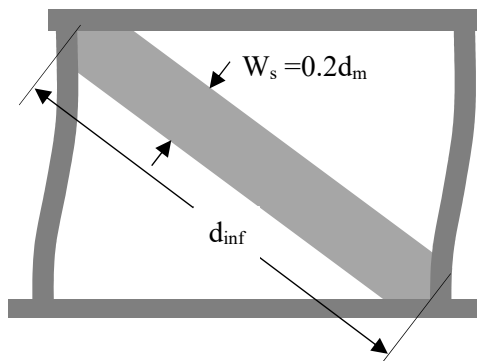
Idealization of masonry infilled RC frame as braced RC frame
